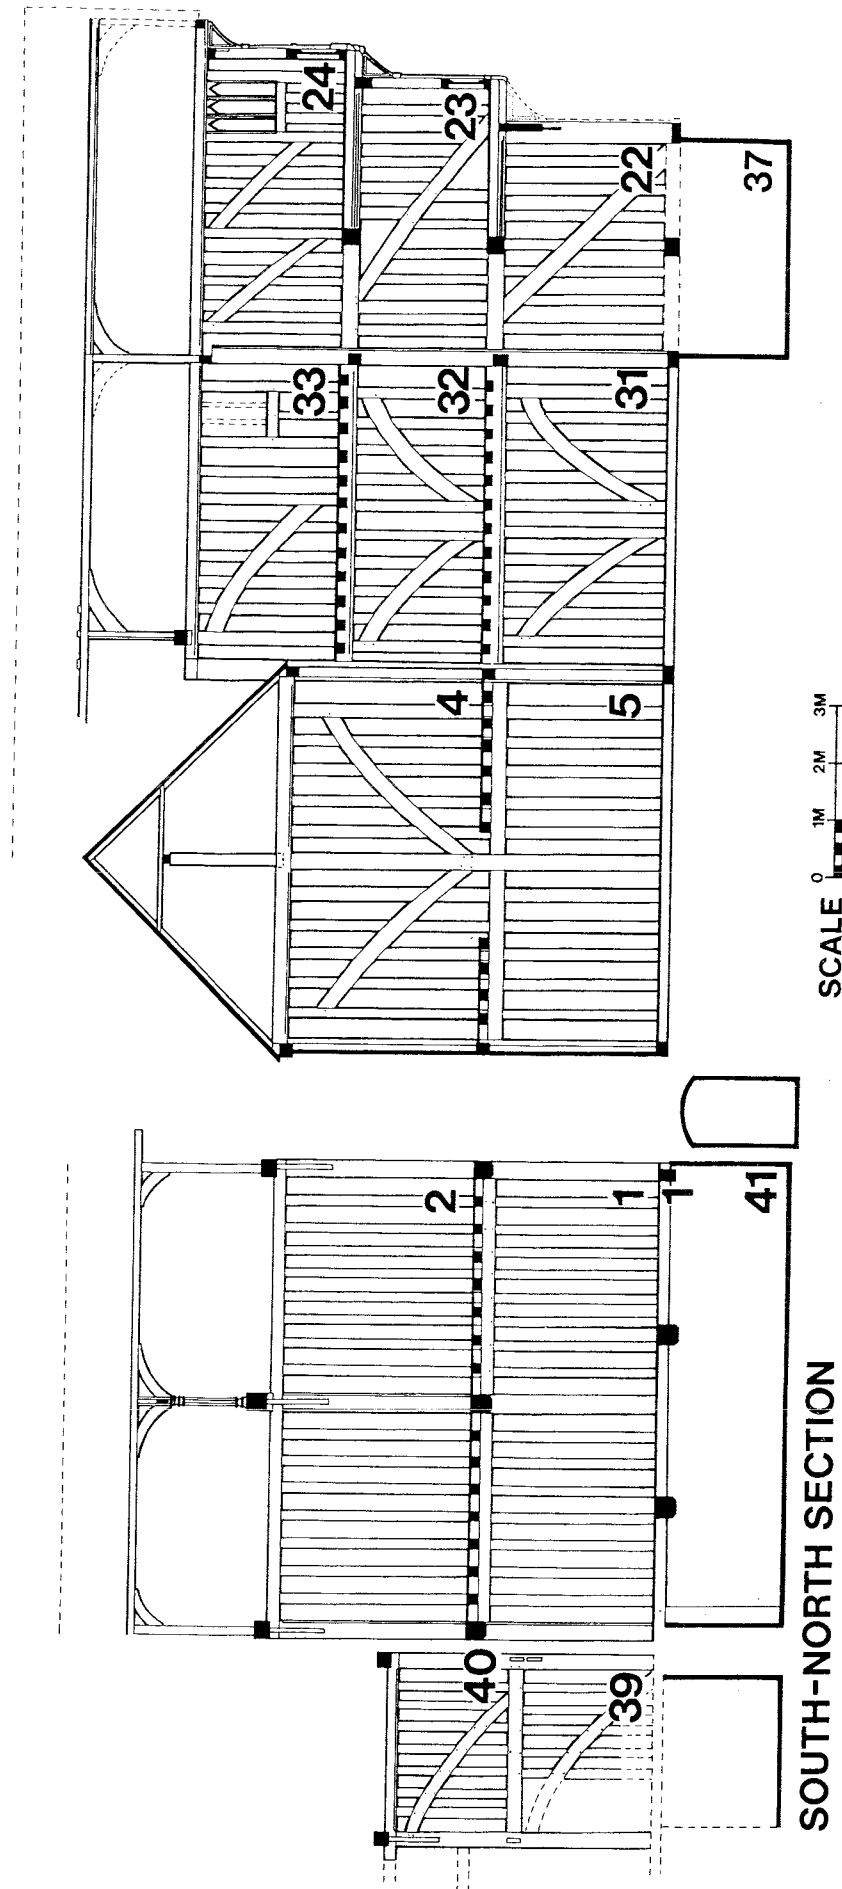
The Red Lion, Colchester. Section through the west wing and southern hall, from south (left) to north (right). For position of this section refer to Fig. 3.
